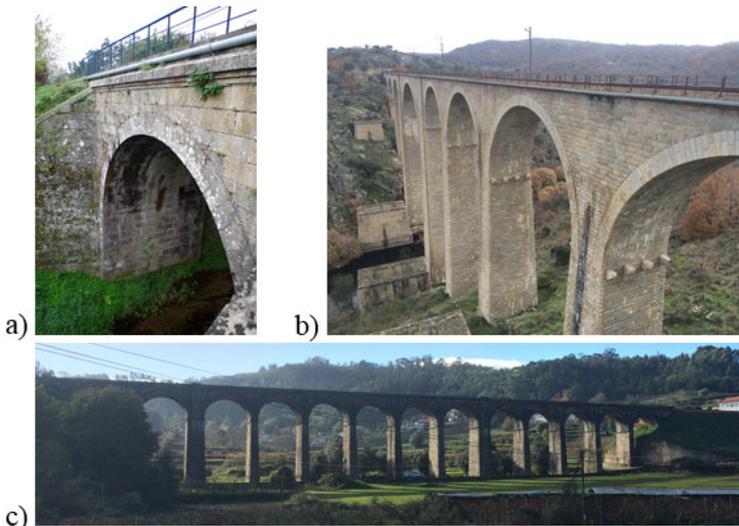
Case studies: a) PK 124 bridge; b) Côa bridge; c) Durrães bridge.
